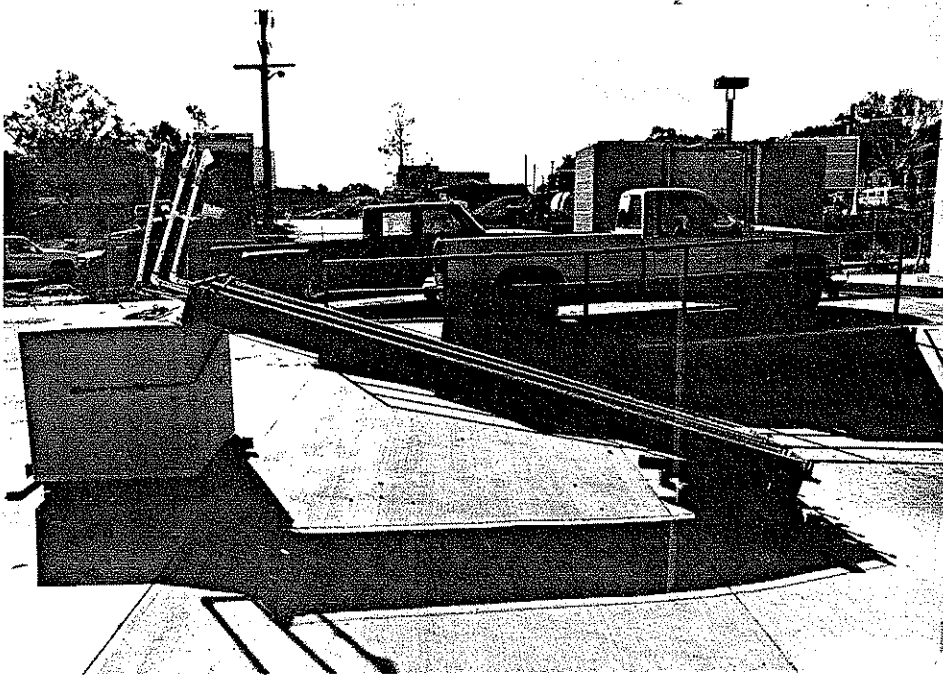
(a) and (b). Setup for the internal grouting of Specimens A3, B3 and C3.
